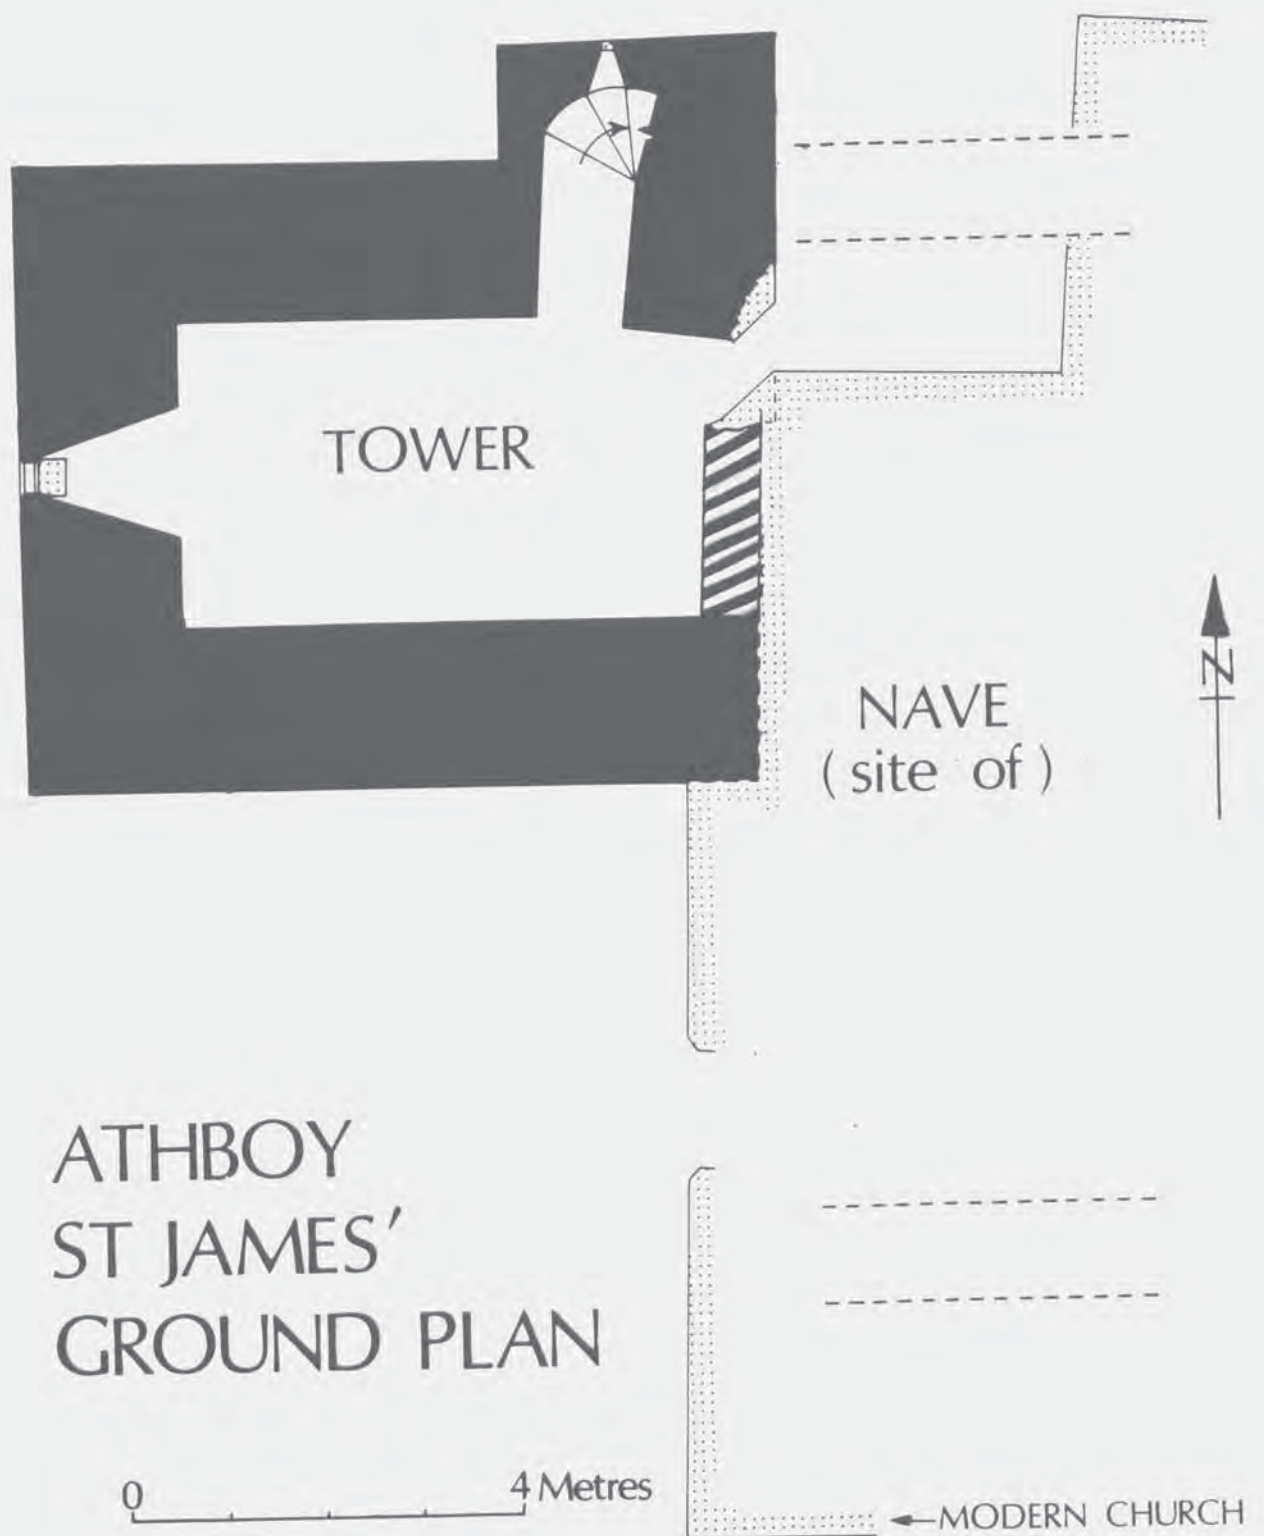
Athboy: St. James' church: west tower: ground plan.
